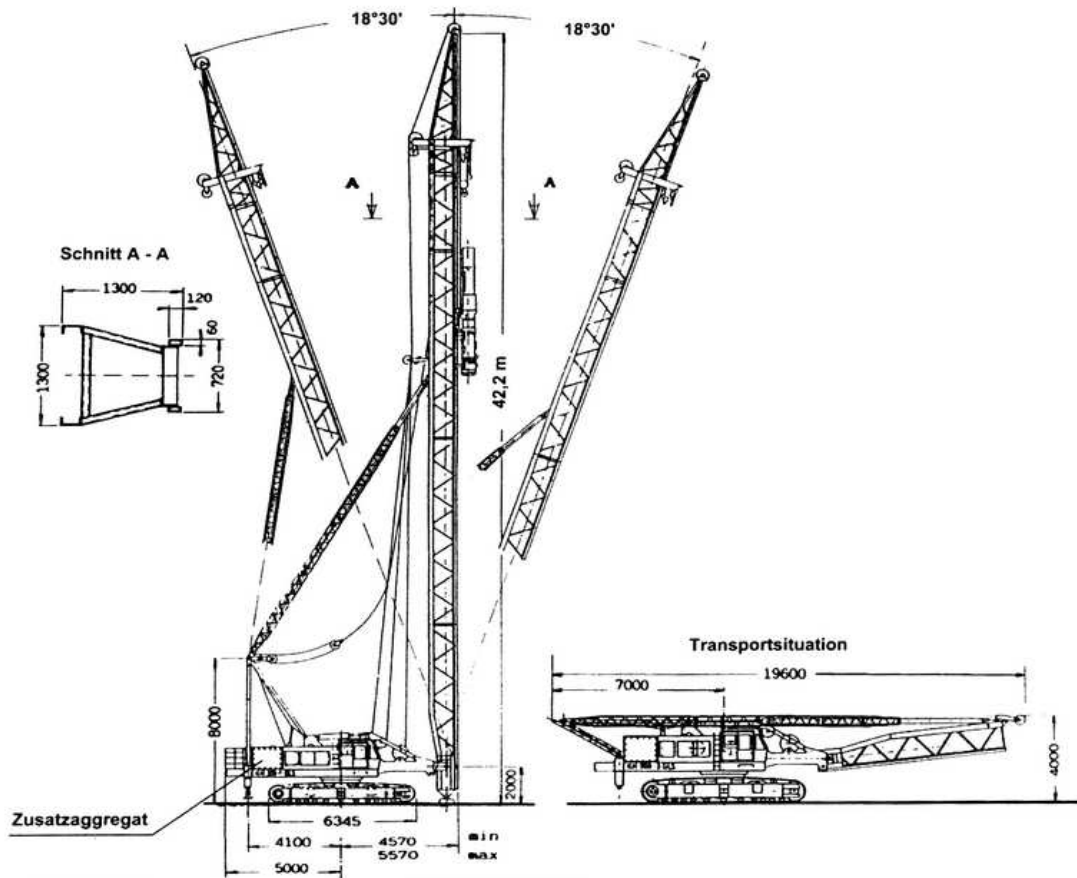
A universal piling rig for prefabricated concrete piles (Handbuch der Ramm- Vibrations- und Einpresstechnik, 2012)
